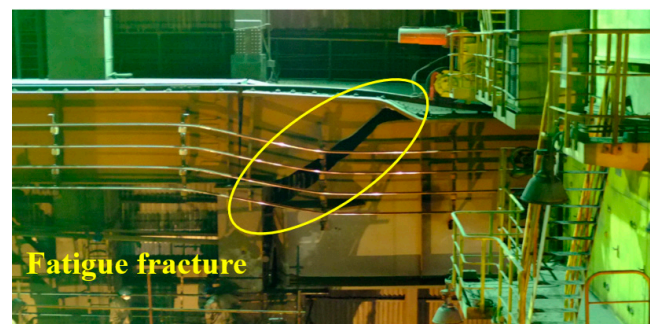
Fatigue fracture of a variable-section support of a steel crane girder.
